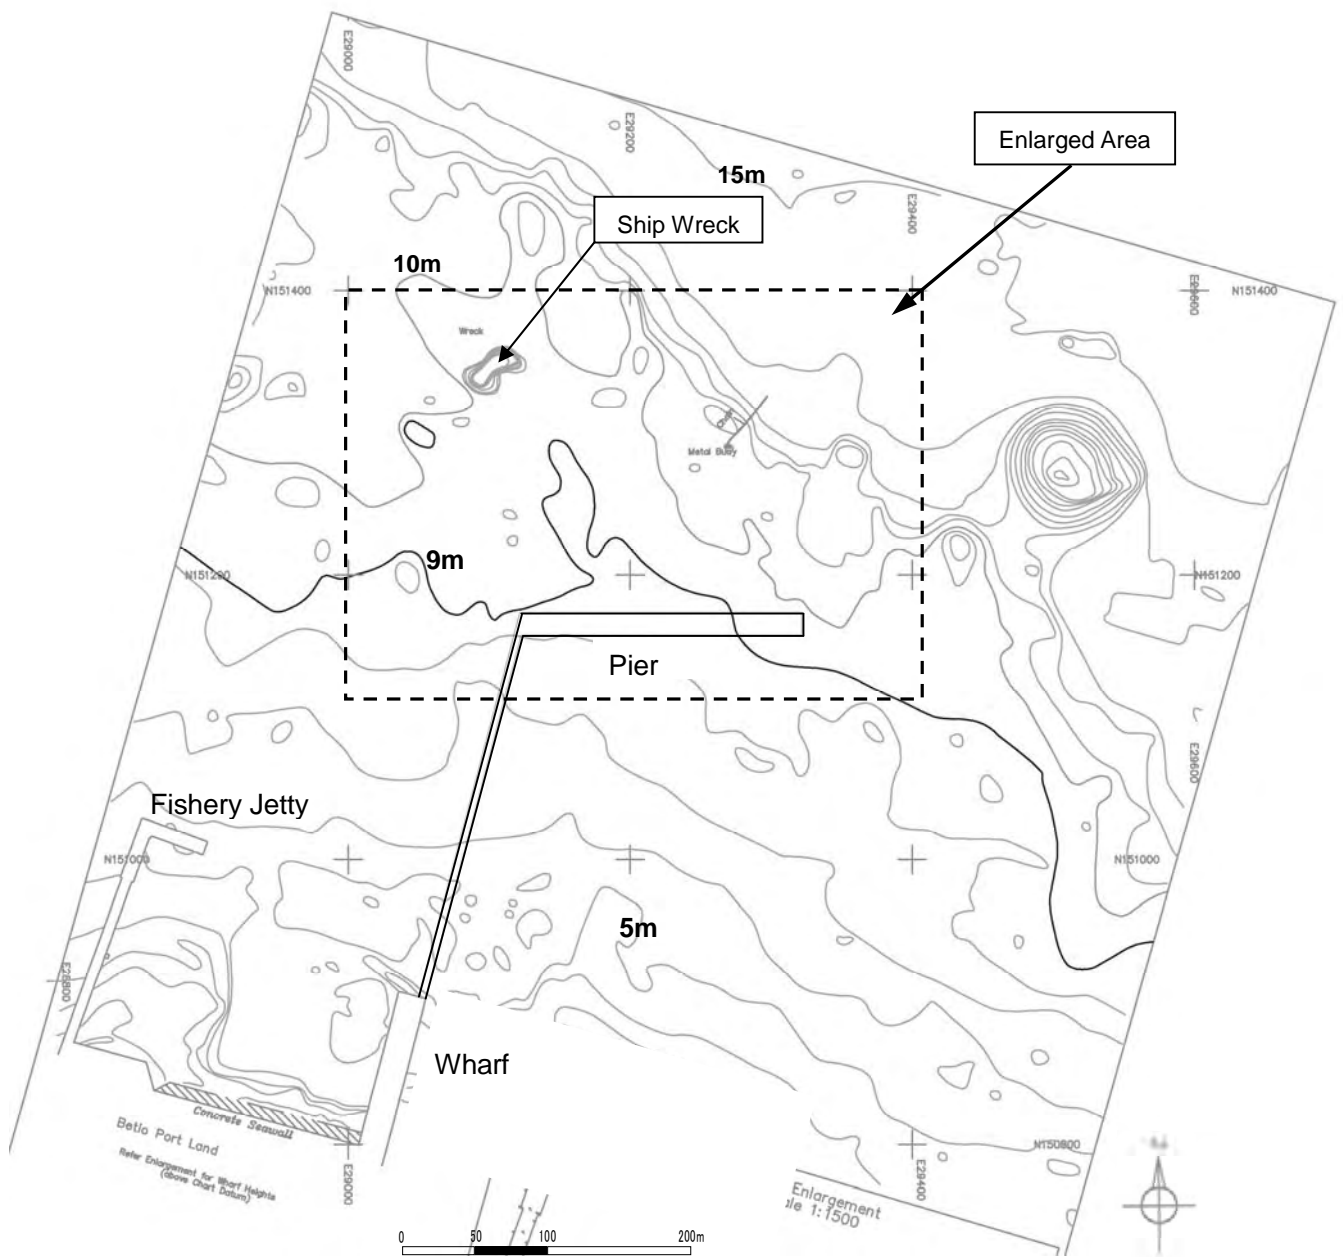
Bathymetry adjacent to the Pier Site
